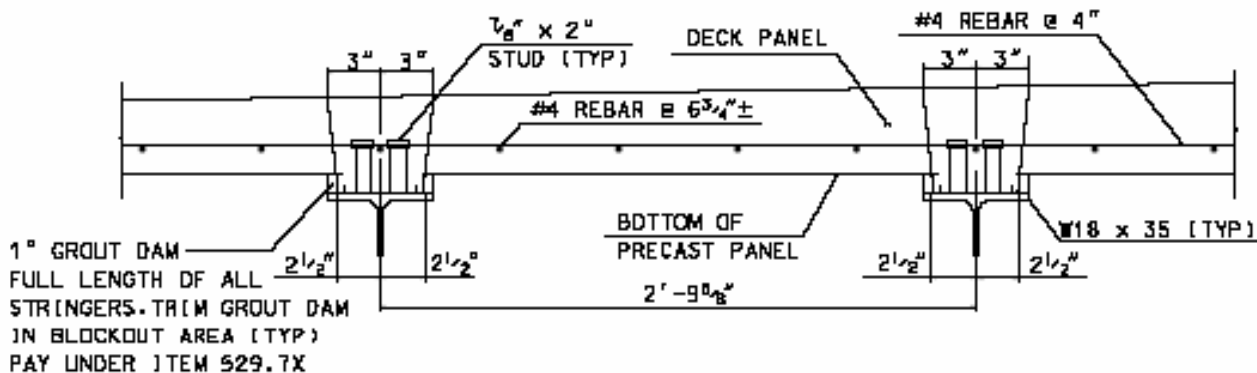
Cross-section elevation showing details of reinforcement
